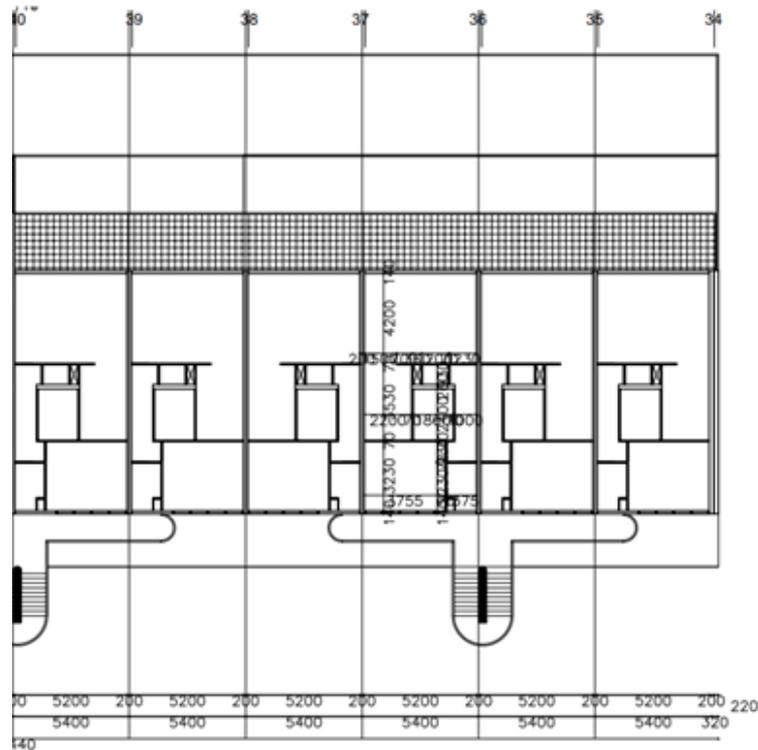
Second floor plan, Building A5, Reigersbos, Amsterdam (Source: TUDELFT)
